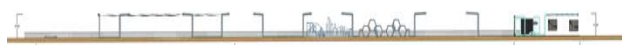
Vertical Section drawing of proposed design model on Thang Long sidewalk
